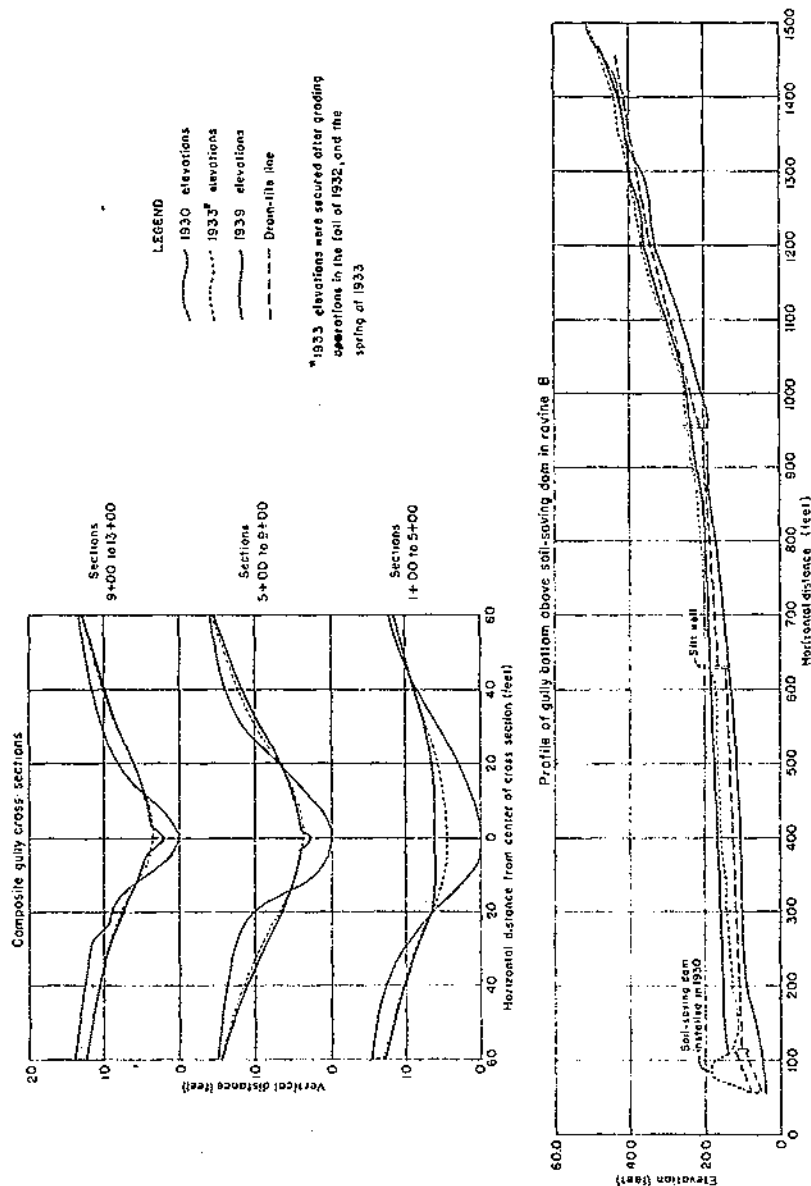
Gully cross sections and profiles above drop-inlet dam in ravine B.
